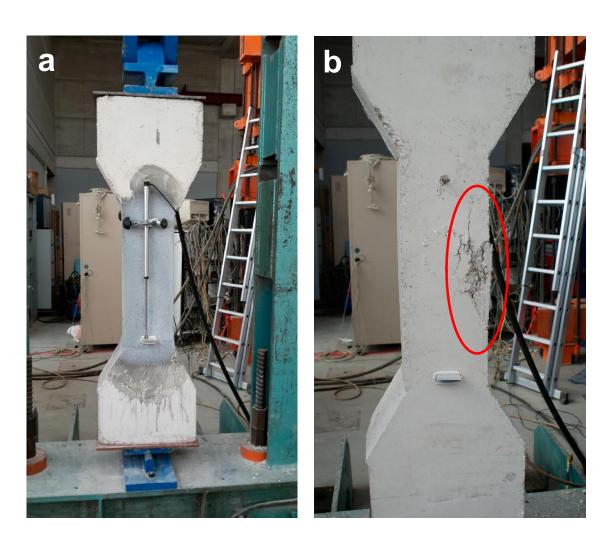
a) Instrumentation of specimen; b) Failure mode: Specimen CC (control column)
